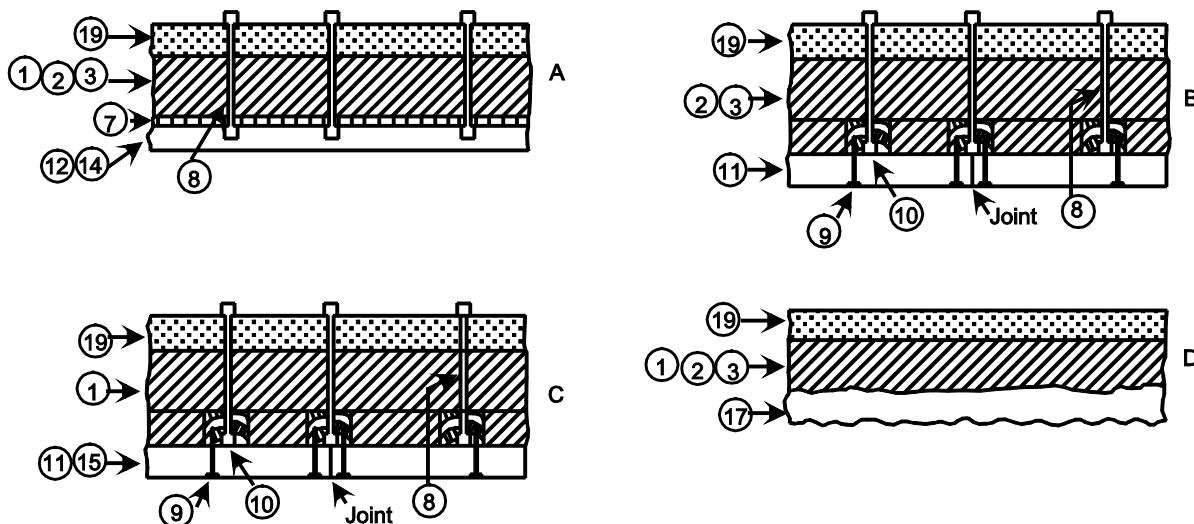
Foam Applied To Underside Of Ceiling Or Roof Deck.
